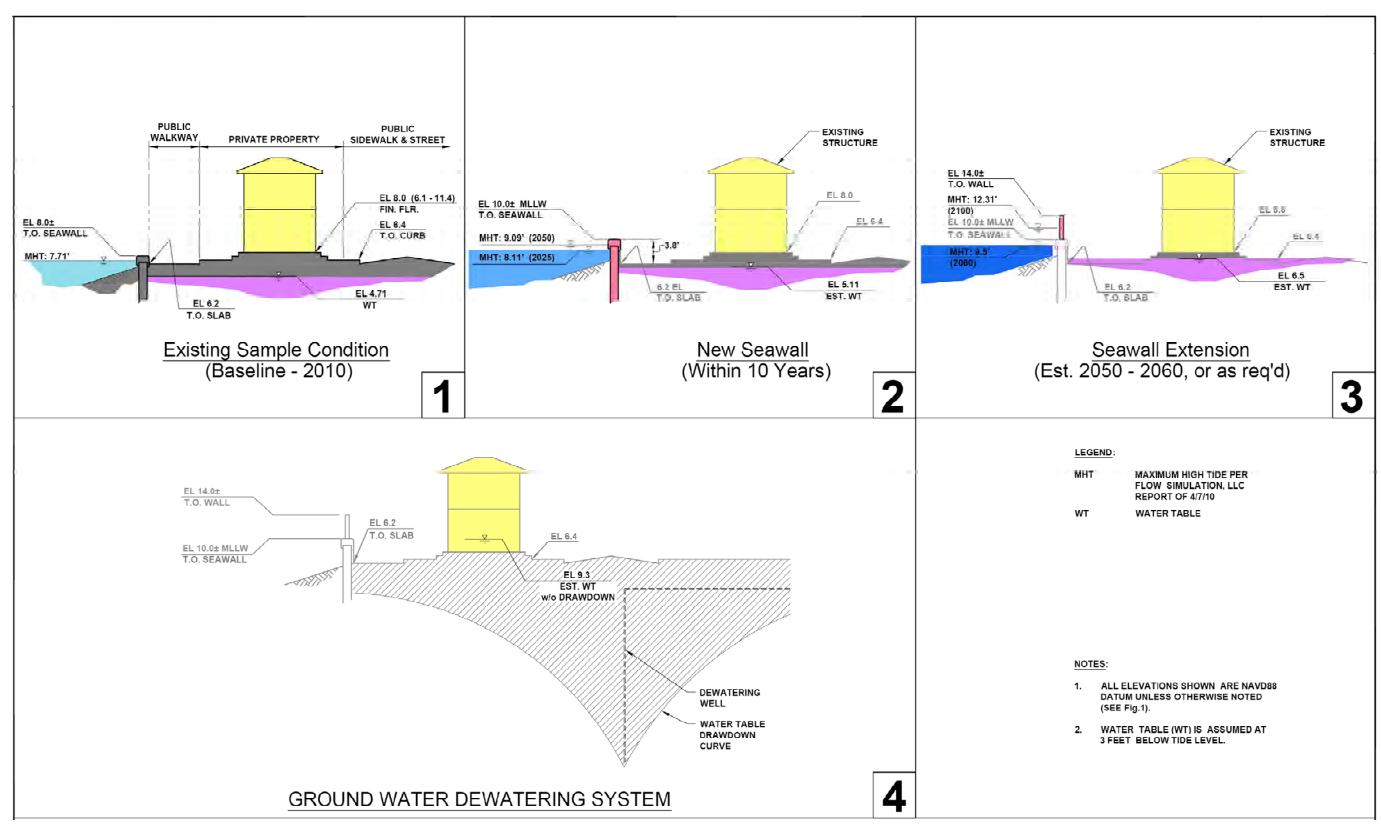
Conceptual Seawall Replacement Implementation Plan
